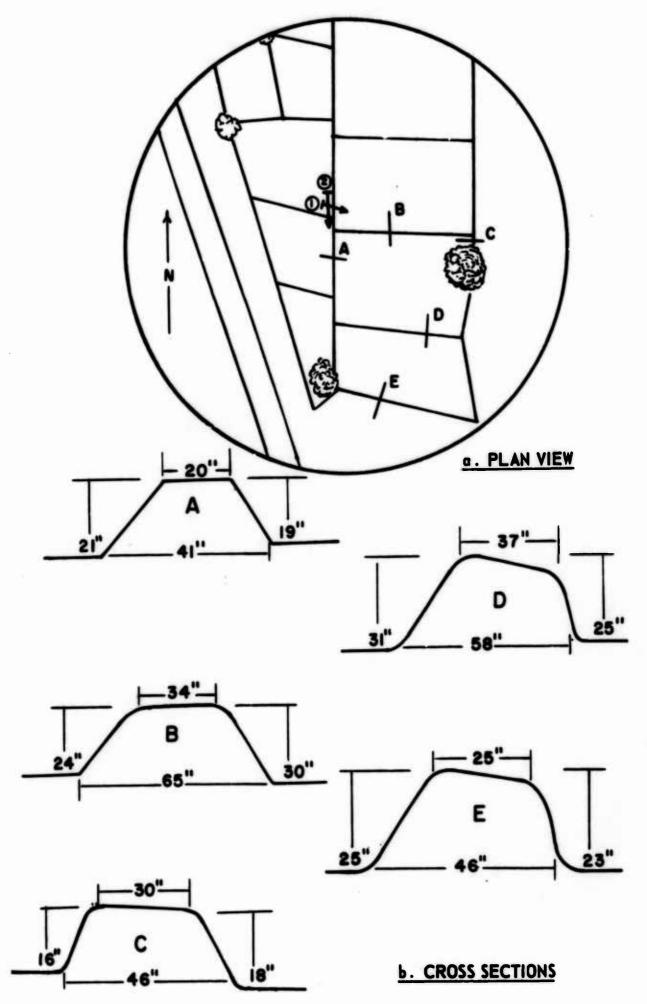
Terraced paddies--dike plan view and cross sections at site SG-81 (September 1964)
